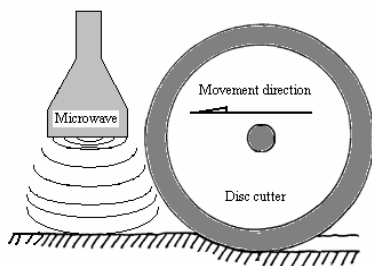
Schematic view of a microwave assisted disc cutter concept of a tunnel boring machine
